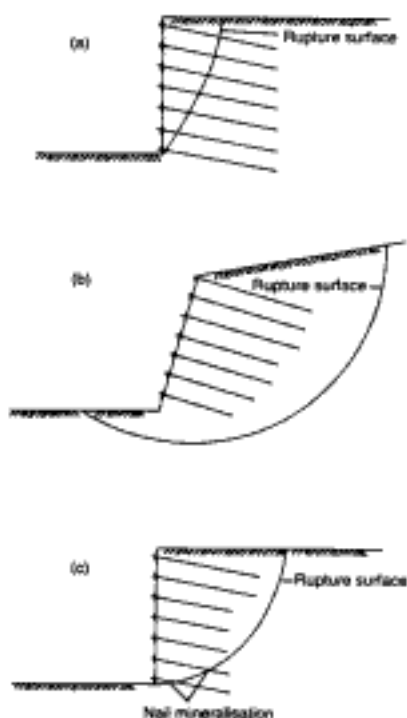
Locations of potential failure surfaces in a nailed wall (Project Clouterre¹⁰)
